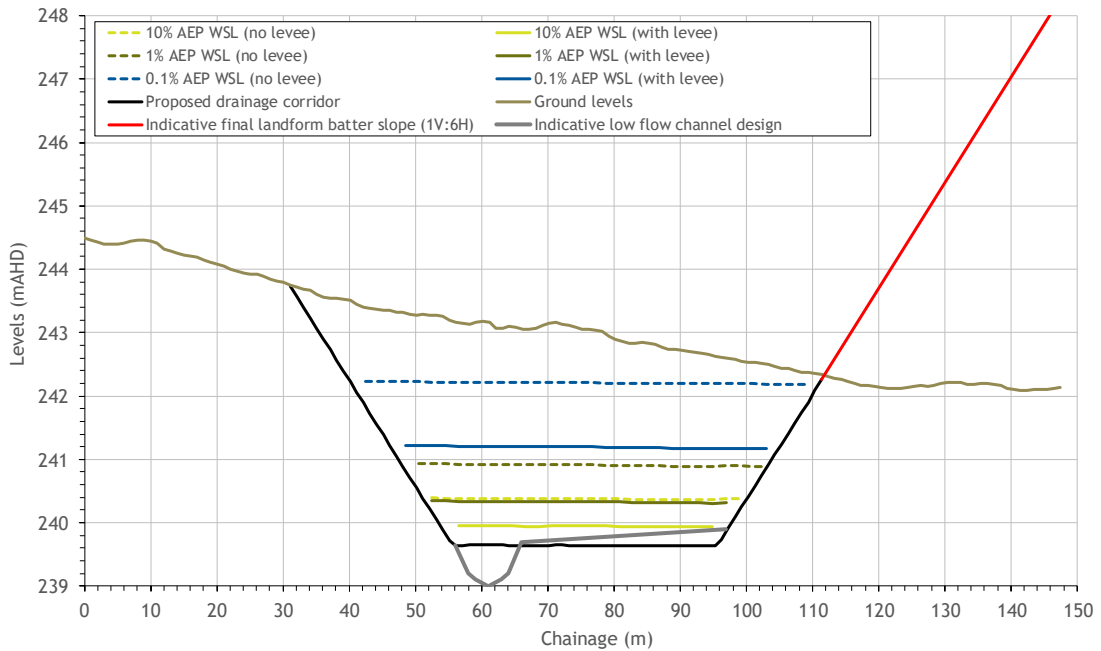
Conceptual cross section of the proposed drainage corridor and the 10%, 1% and 0.1% AEP event water surface elevations for both levee scenarios
